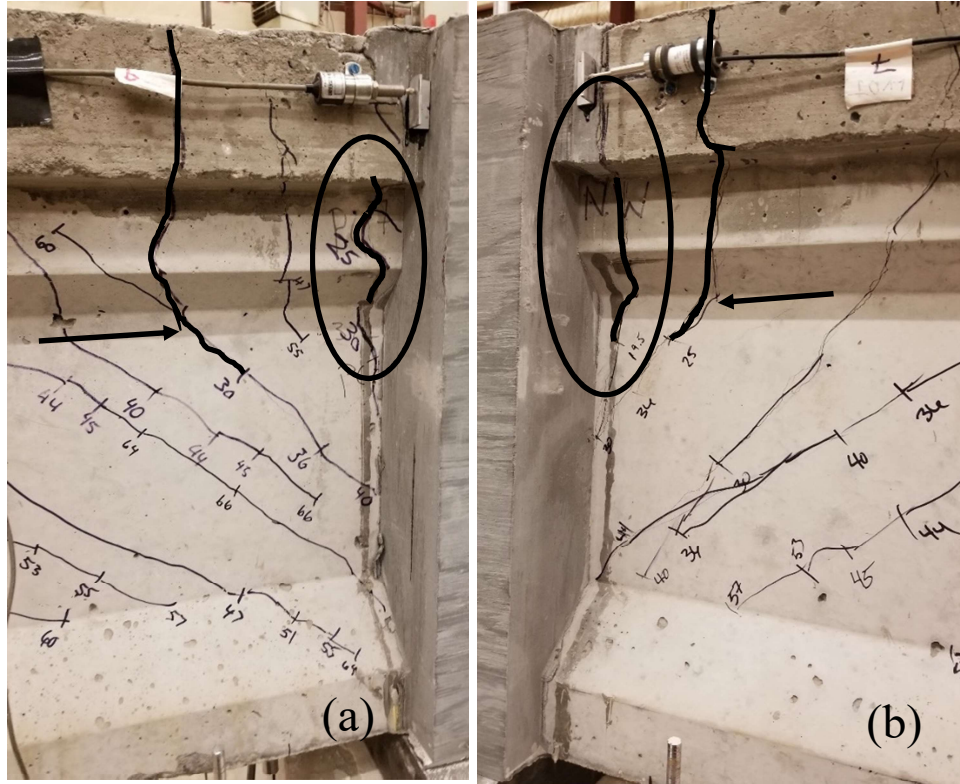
Initial flexural cracking on the RC2-N girder at 25 kips of load and initial flexure-shear cracking on the RC2-N girder at 30 kips of load (a) and initial flexural cracking on the RC2-S girder at 19.5 kips of load and flexure-shear cracking on the RC2-S girder at 25 kips of load (b). Dark ovals show the initial flexural cracking near the continuity joint and arrows point to the dark lines that indicate the initial flexure-shear cracking.
